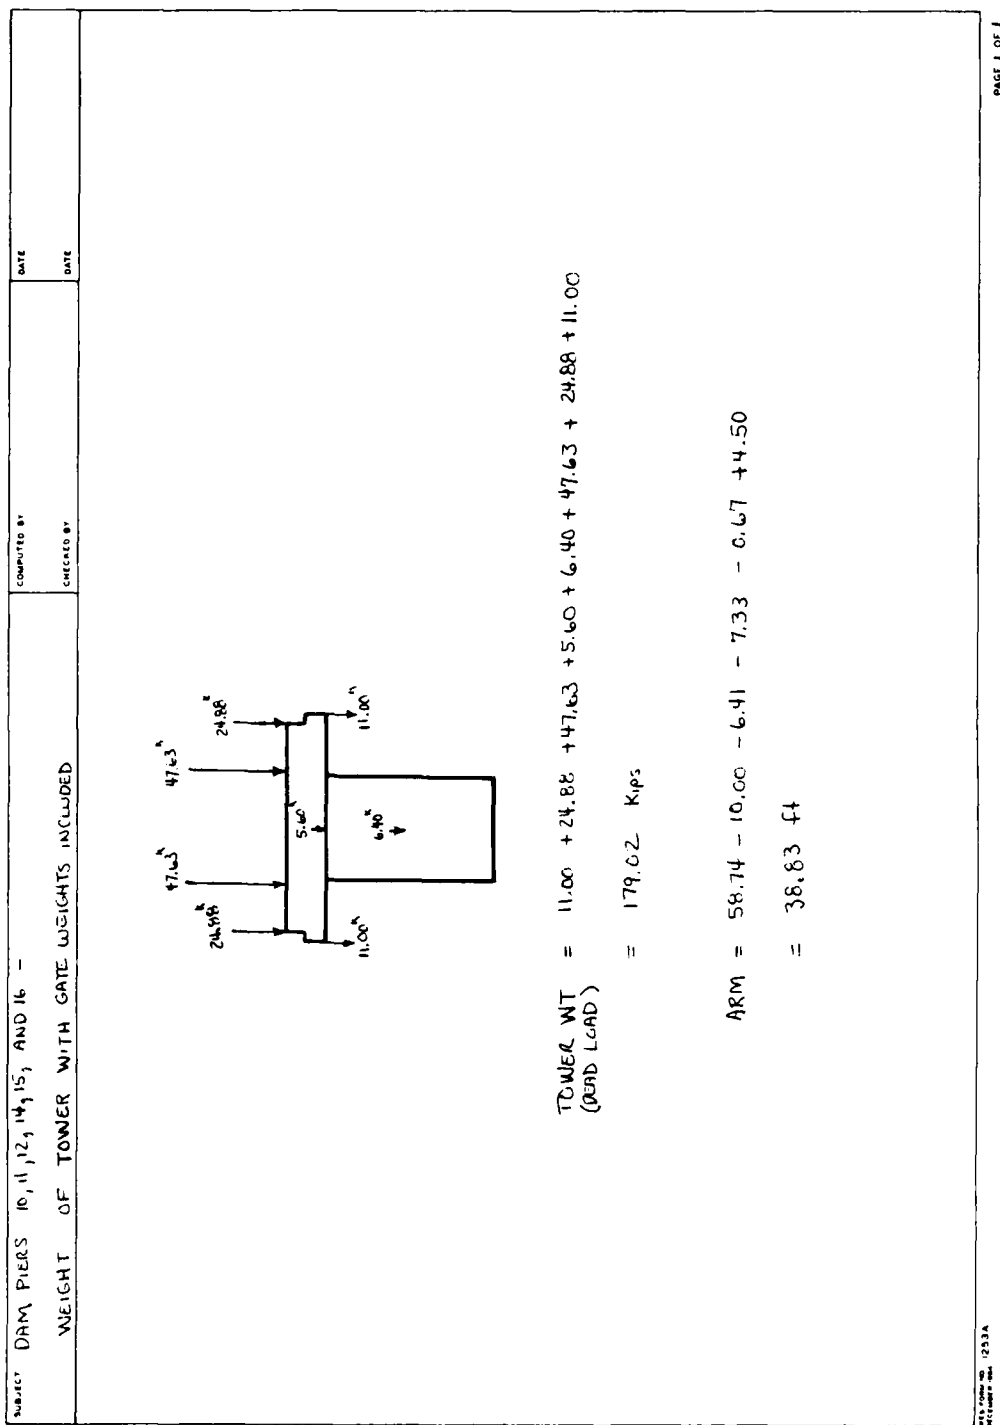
Weight of tower on pier, dam piers 10, 11, 12, 14, 15, and 16, Soo Dam
